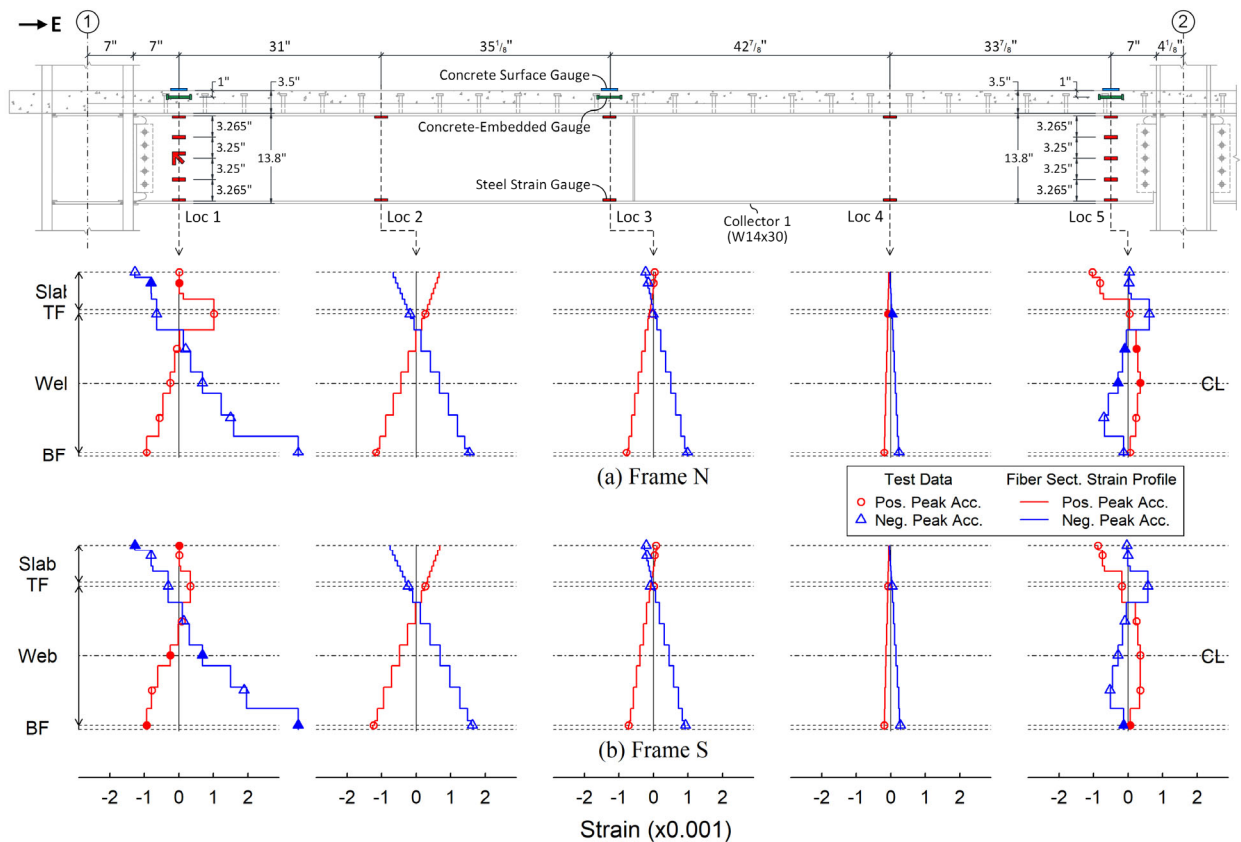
Test 2B-5: Fiber Section Strain Profiles of 2<sup>nd</sup> Floor Collector 1
